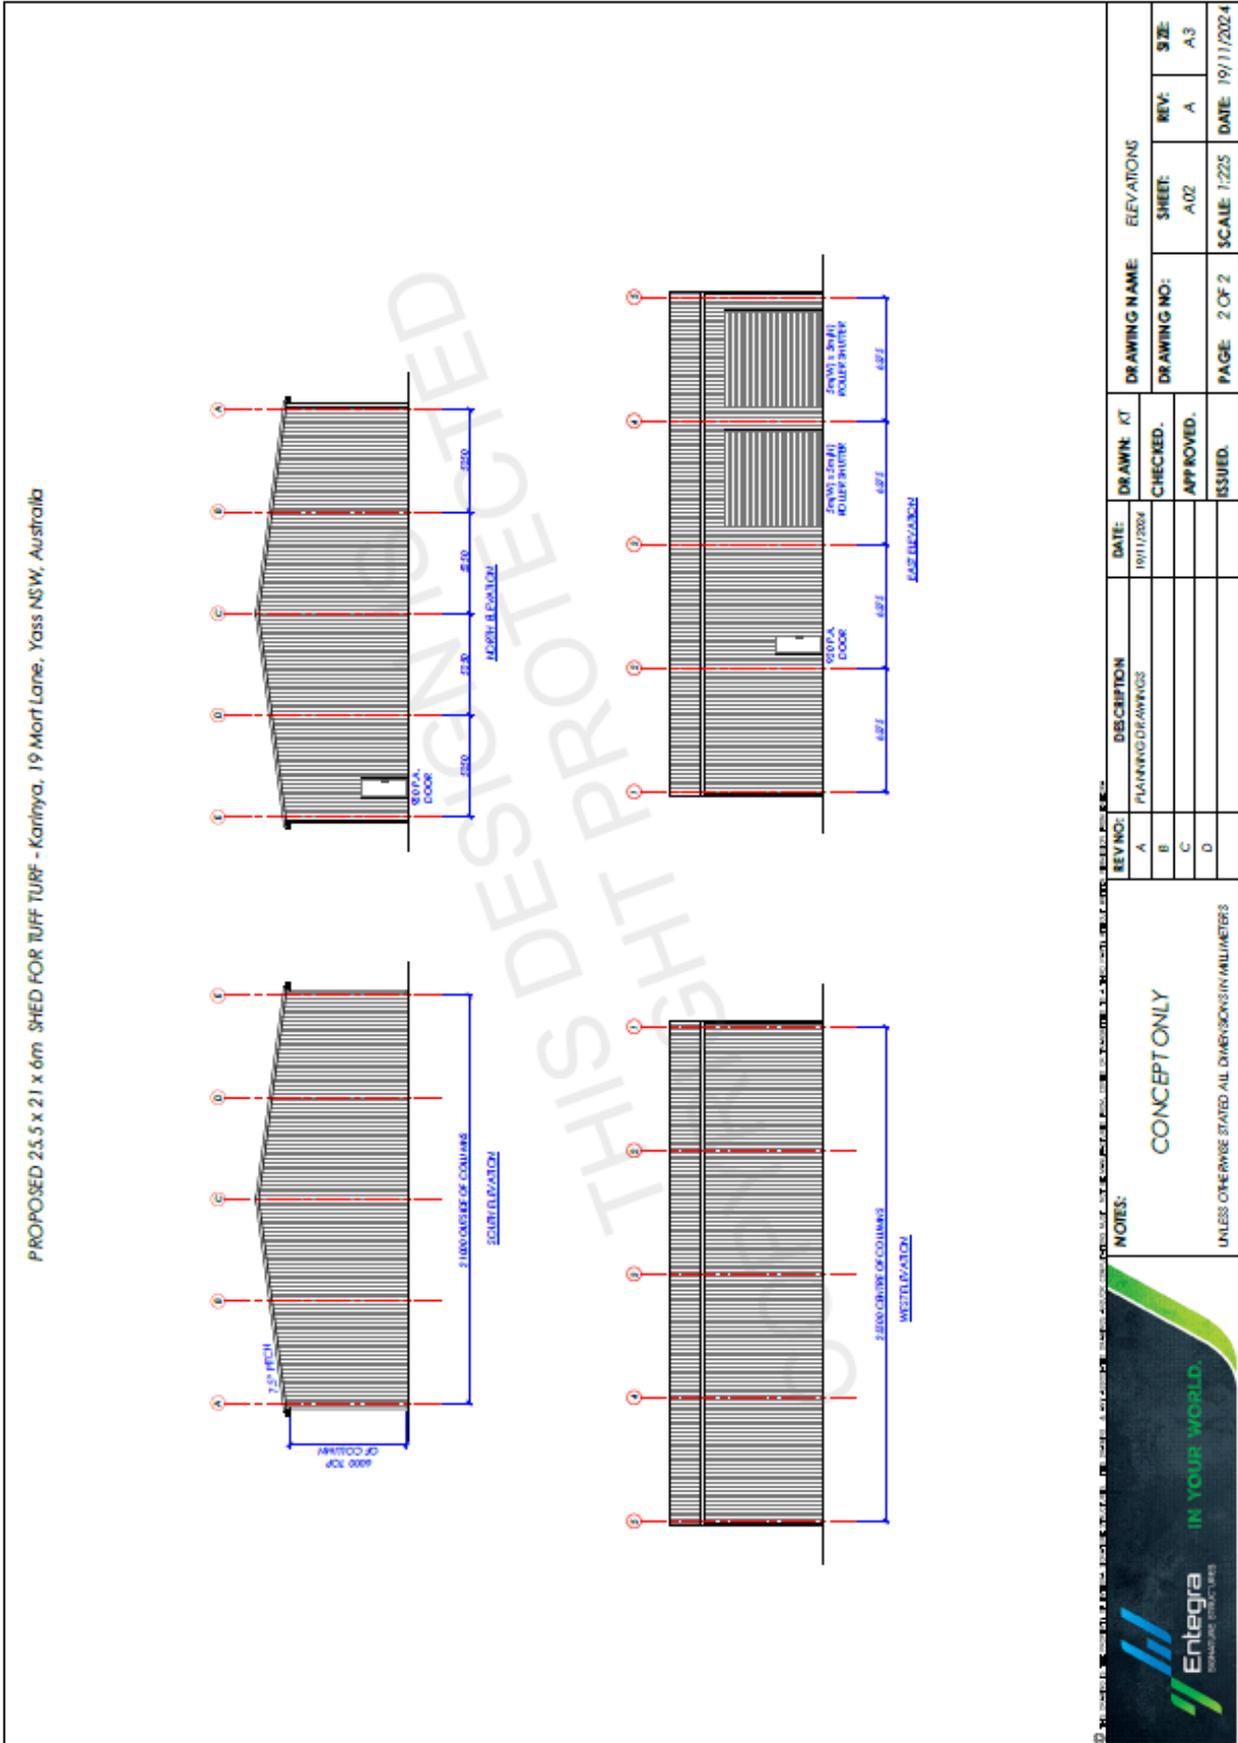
Proposed Elevations Plan (Source: Entegra Signature Structures, February 2025)
